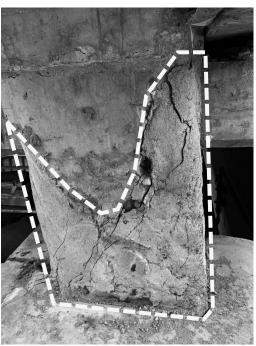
Cracked and unsound previous concrete repair at Column 10A. Eight grout pockets are visible at the ends of the beam PT tendons.
